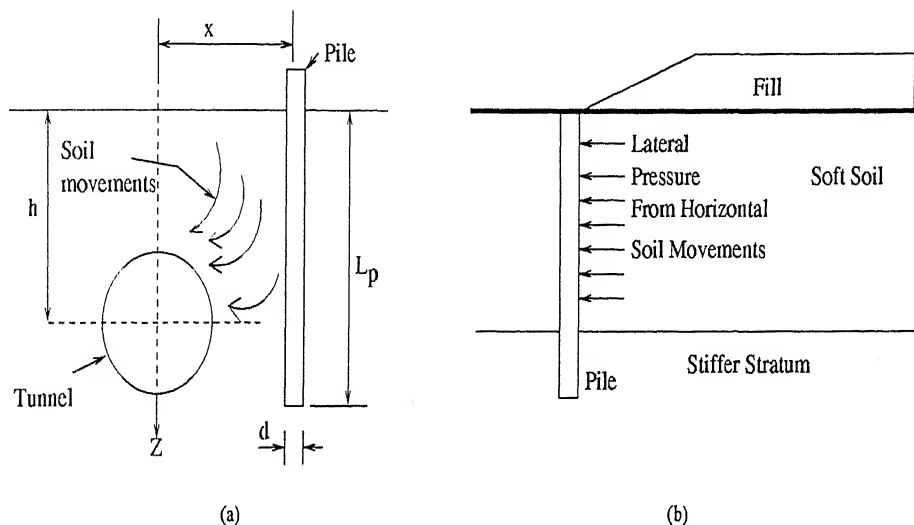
Piles Subjected to Passive Lateral Loads (a) Pile Adjacent to Tunnel and (b) an Embankment.
